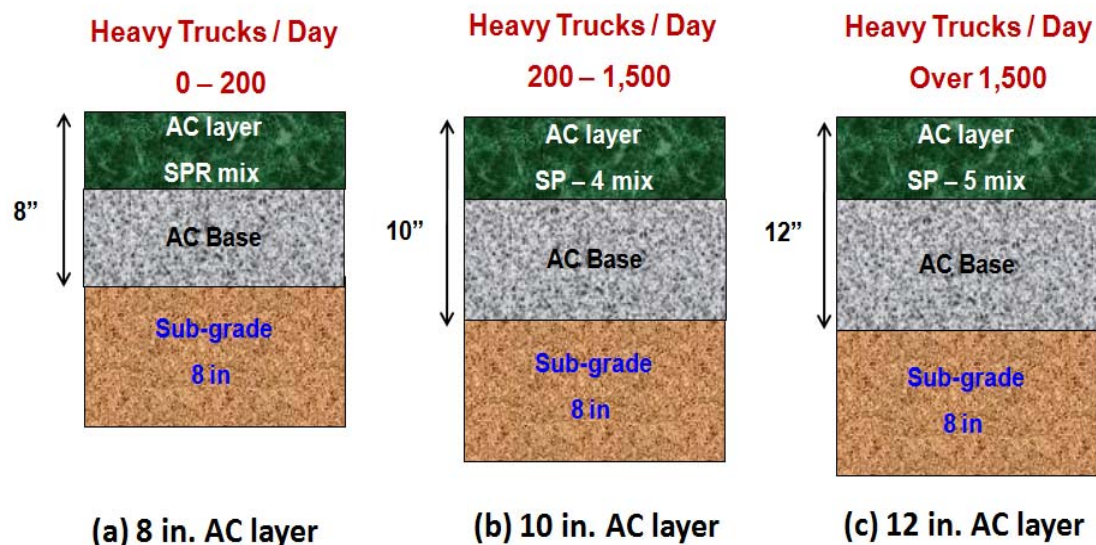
Typical Full-Depth Asphalt Pavement Structures Used in Nebraska
